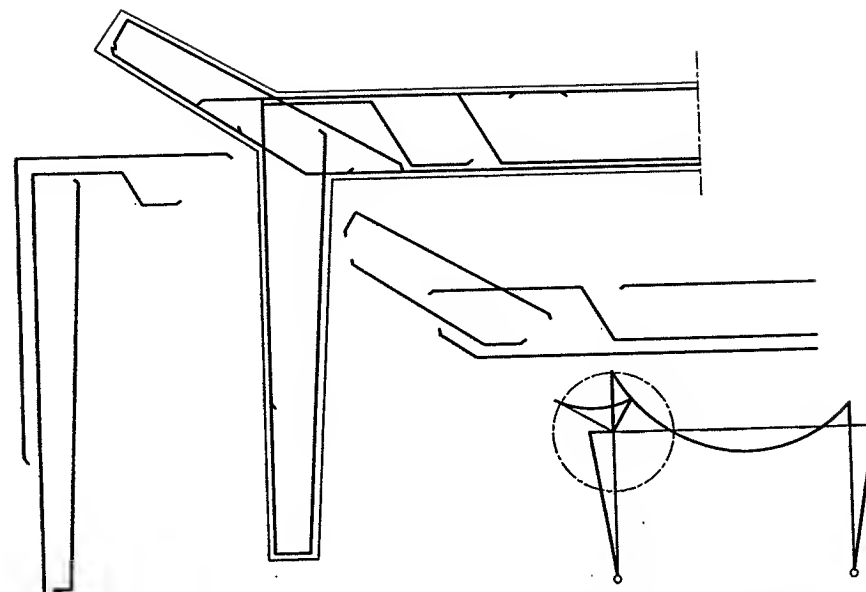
Detailing of Frame Joints (Detail-7)
